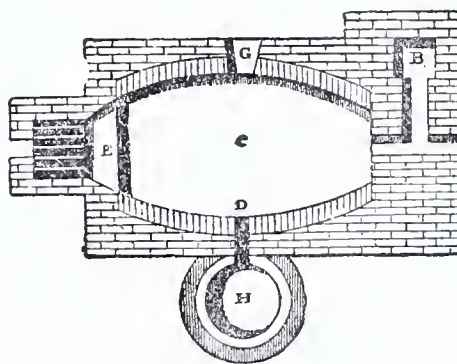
Tin Smelting Reverberatory Furnace and Refining Kettle. Plan.
